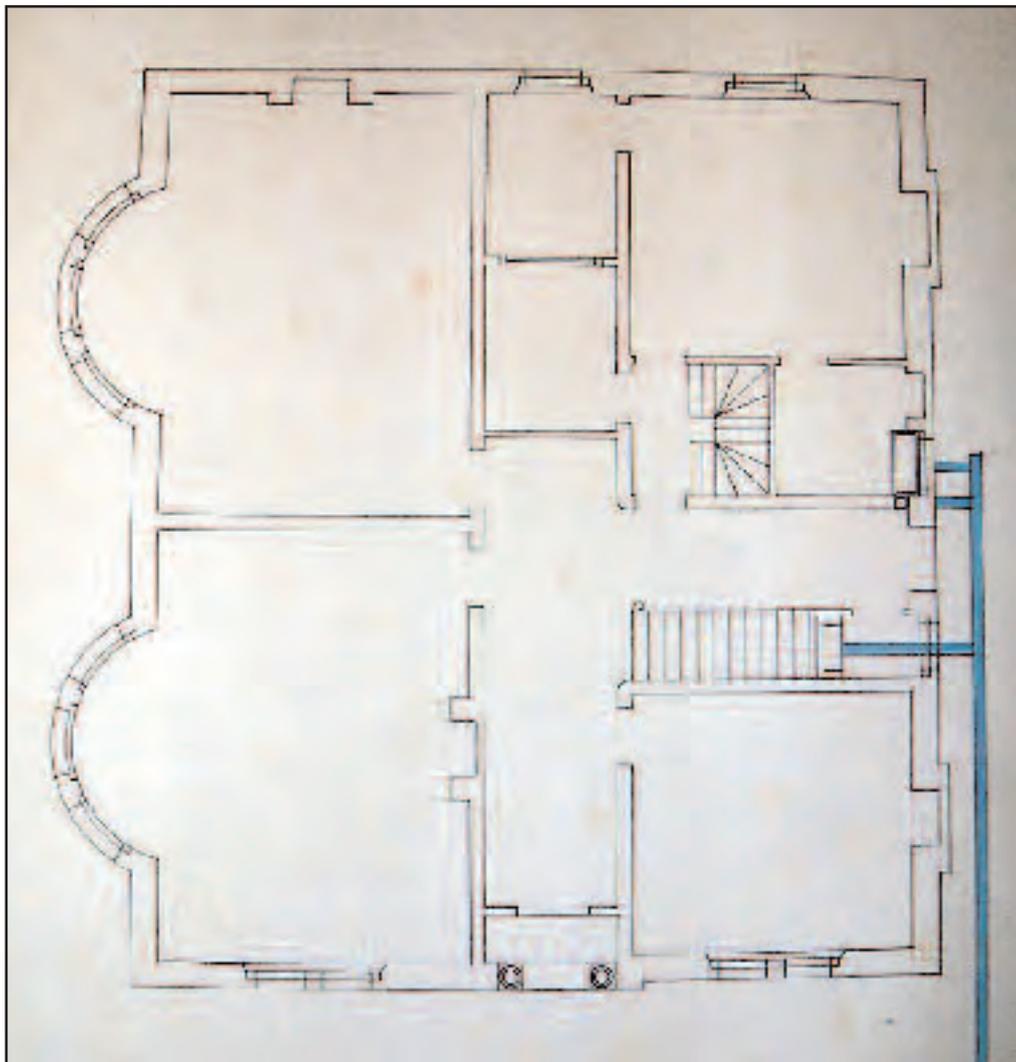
Ground floor plan of The Priory (9 Priory Road), 1872
